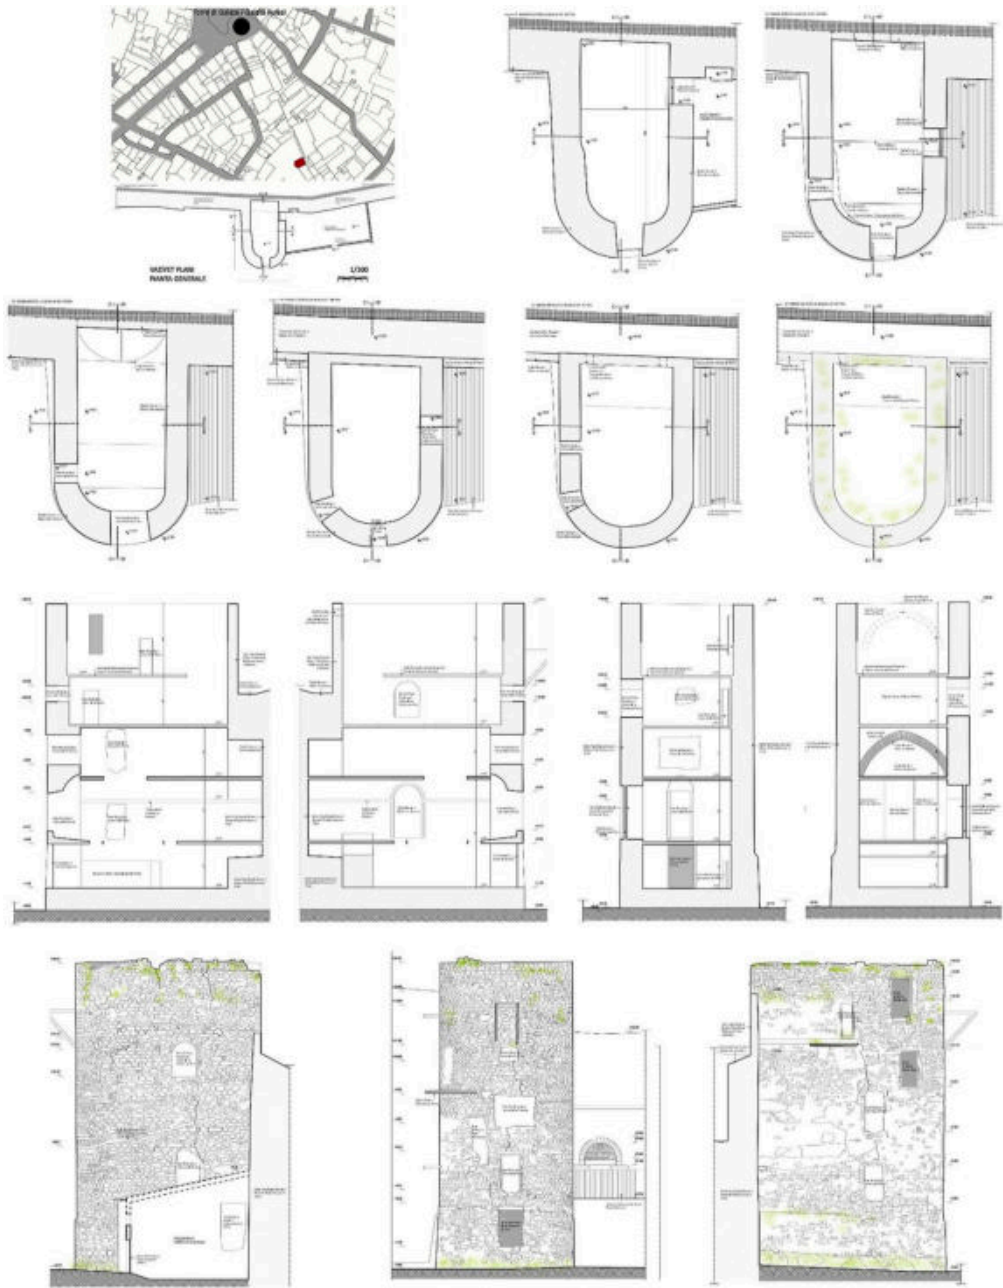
Digital drawings of the Genoese tower. Plan view, plans, cross sections, and elevations, original scale 1:50 (editing by Doruk Peker)
